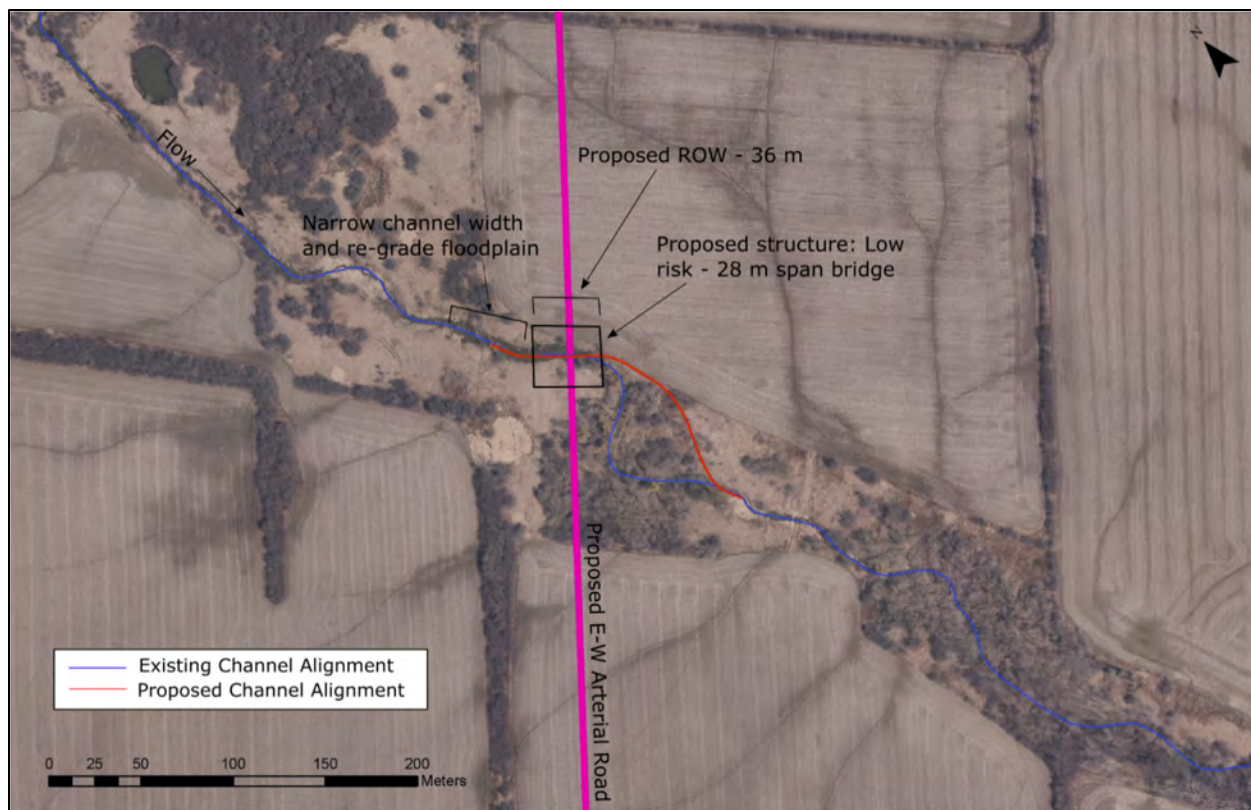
Gore Road Tributary Crossing Proposed East West Arterial Road (Crossing A) - Alignment Option 2
